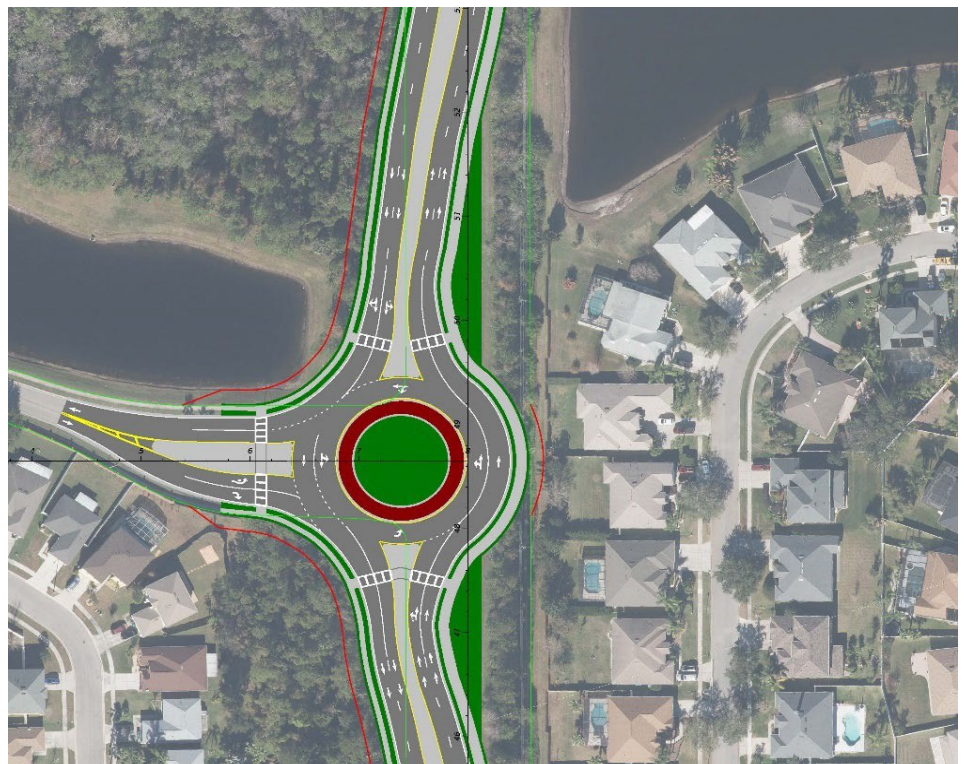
8 Roundabout Control Option at Corner Lake Drive Under Build Conditions (Four- Lane Widening Section on Chuluota Road)
